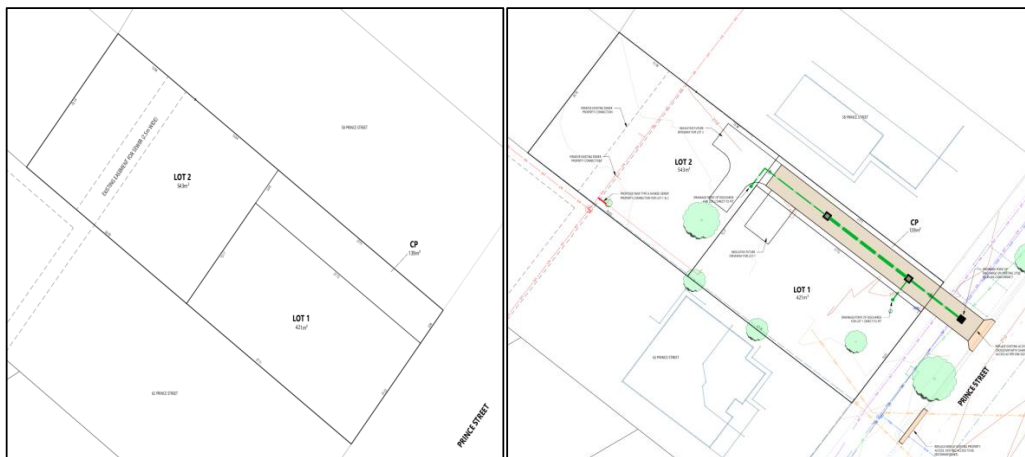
Shows the proposed subdivision plan (Left) and the development concept, with altered crossover (Right)
